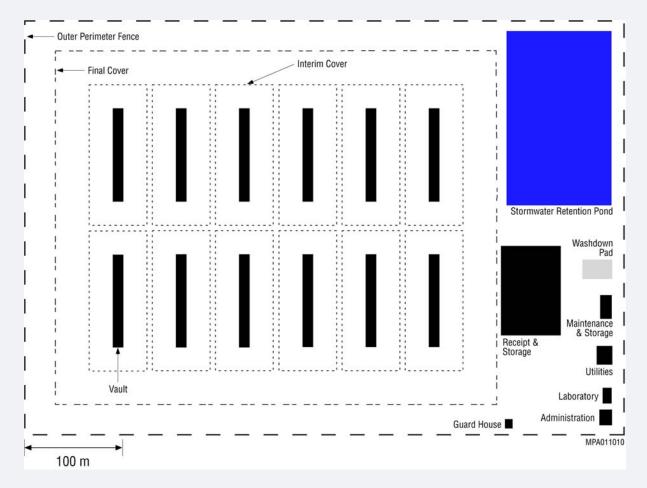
Layout of a Conceptual Vault Disposal Facility
